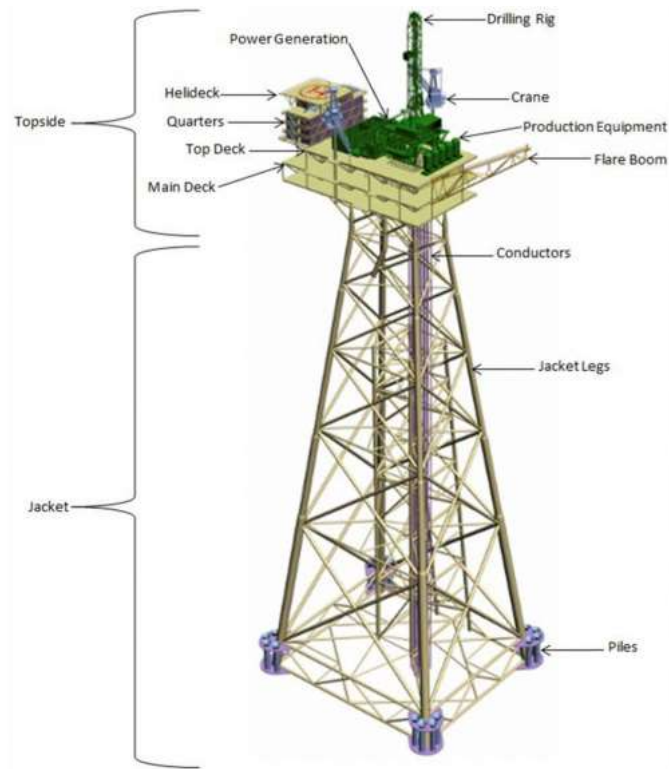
Diagram of a typical Steel Piled Jacket platform
